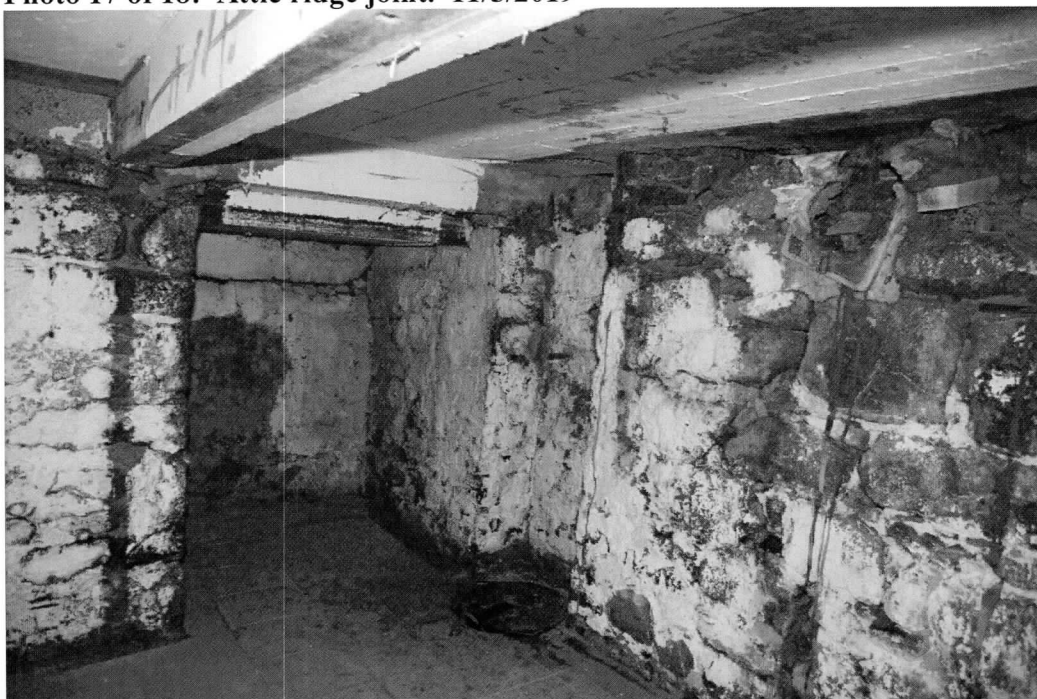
of 18: Basement, view northeast showing street access. 11/20/2019
